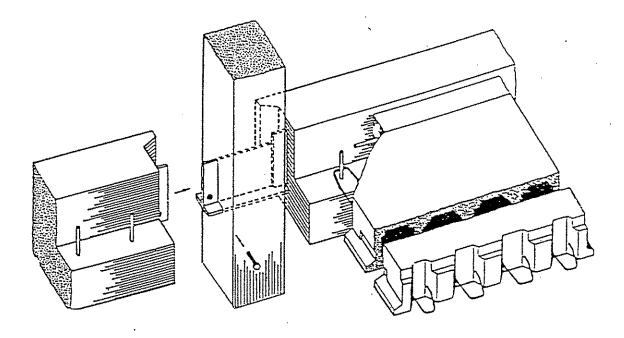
Column-to-edge beam connection detail. The steel plate from the column is bolted to the steel beam plate for stability during erection [adapted from Bison Concrete 1970].
